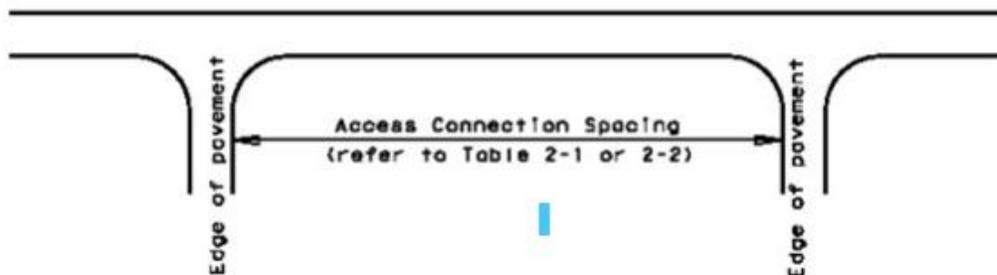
Access Connection Spacing Diagram (Source: TxDot Manuals)
